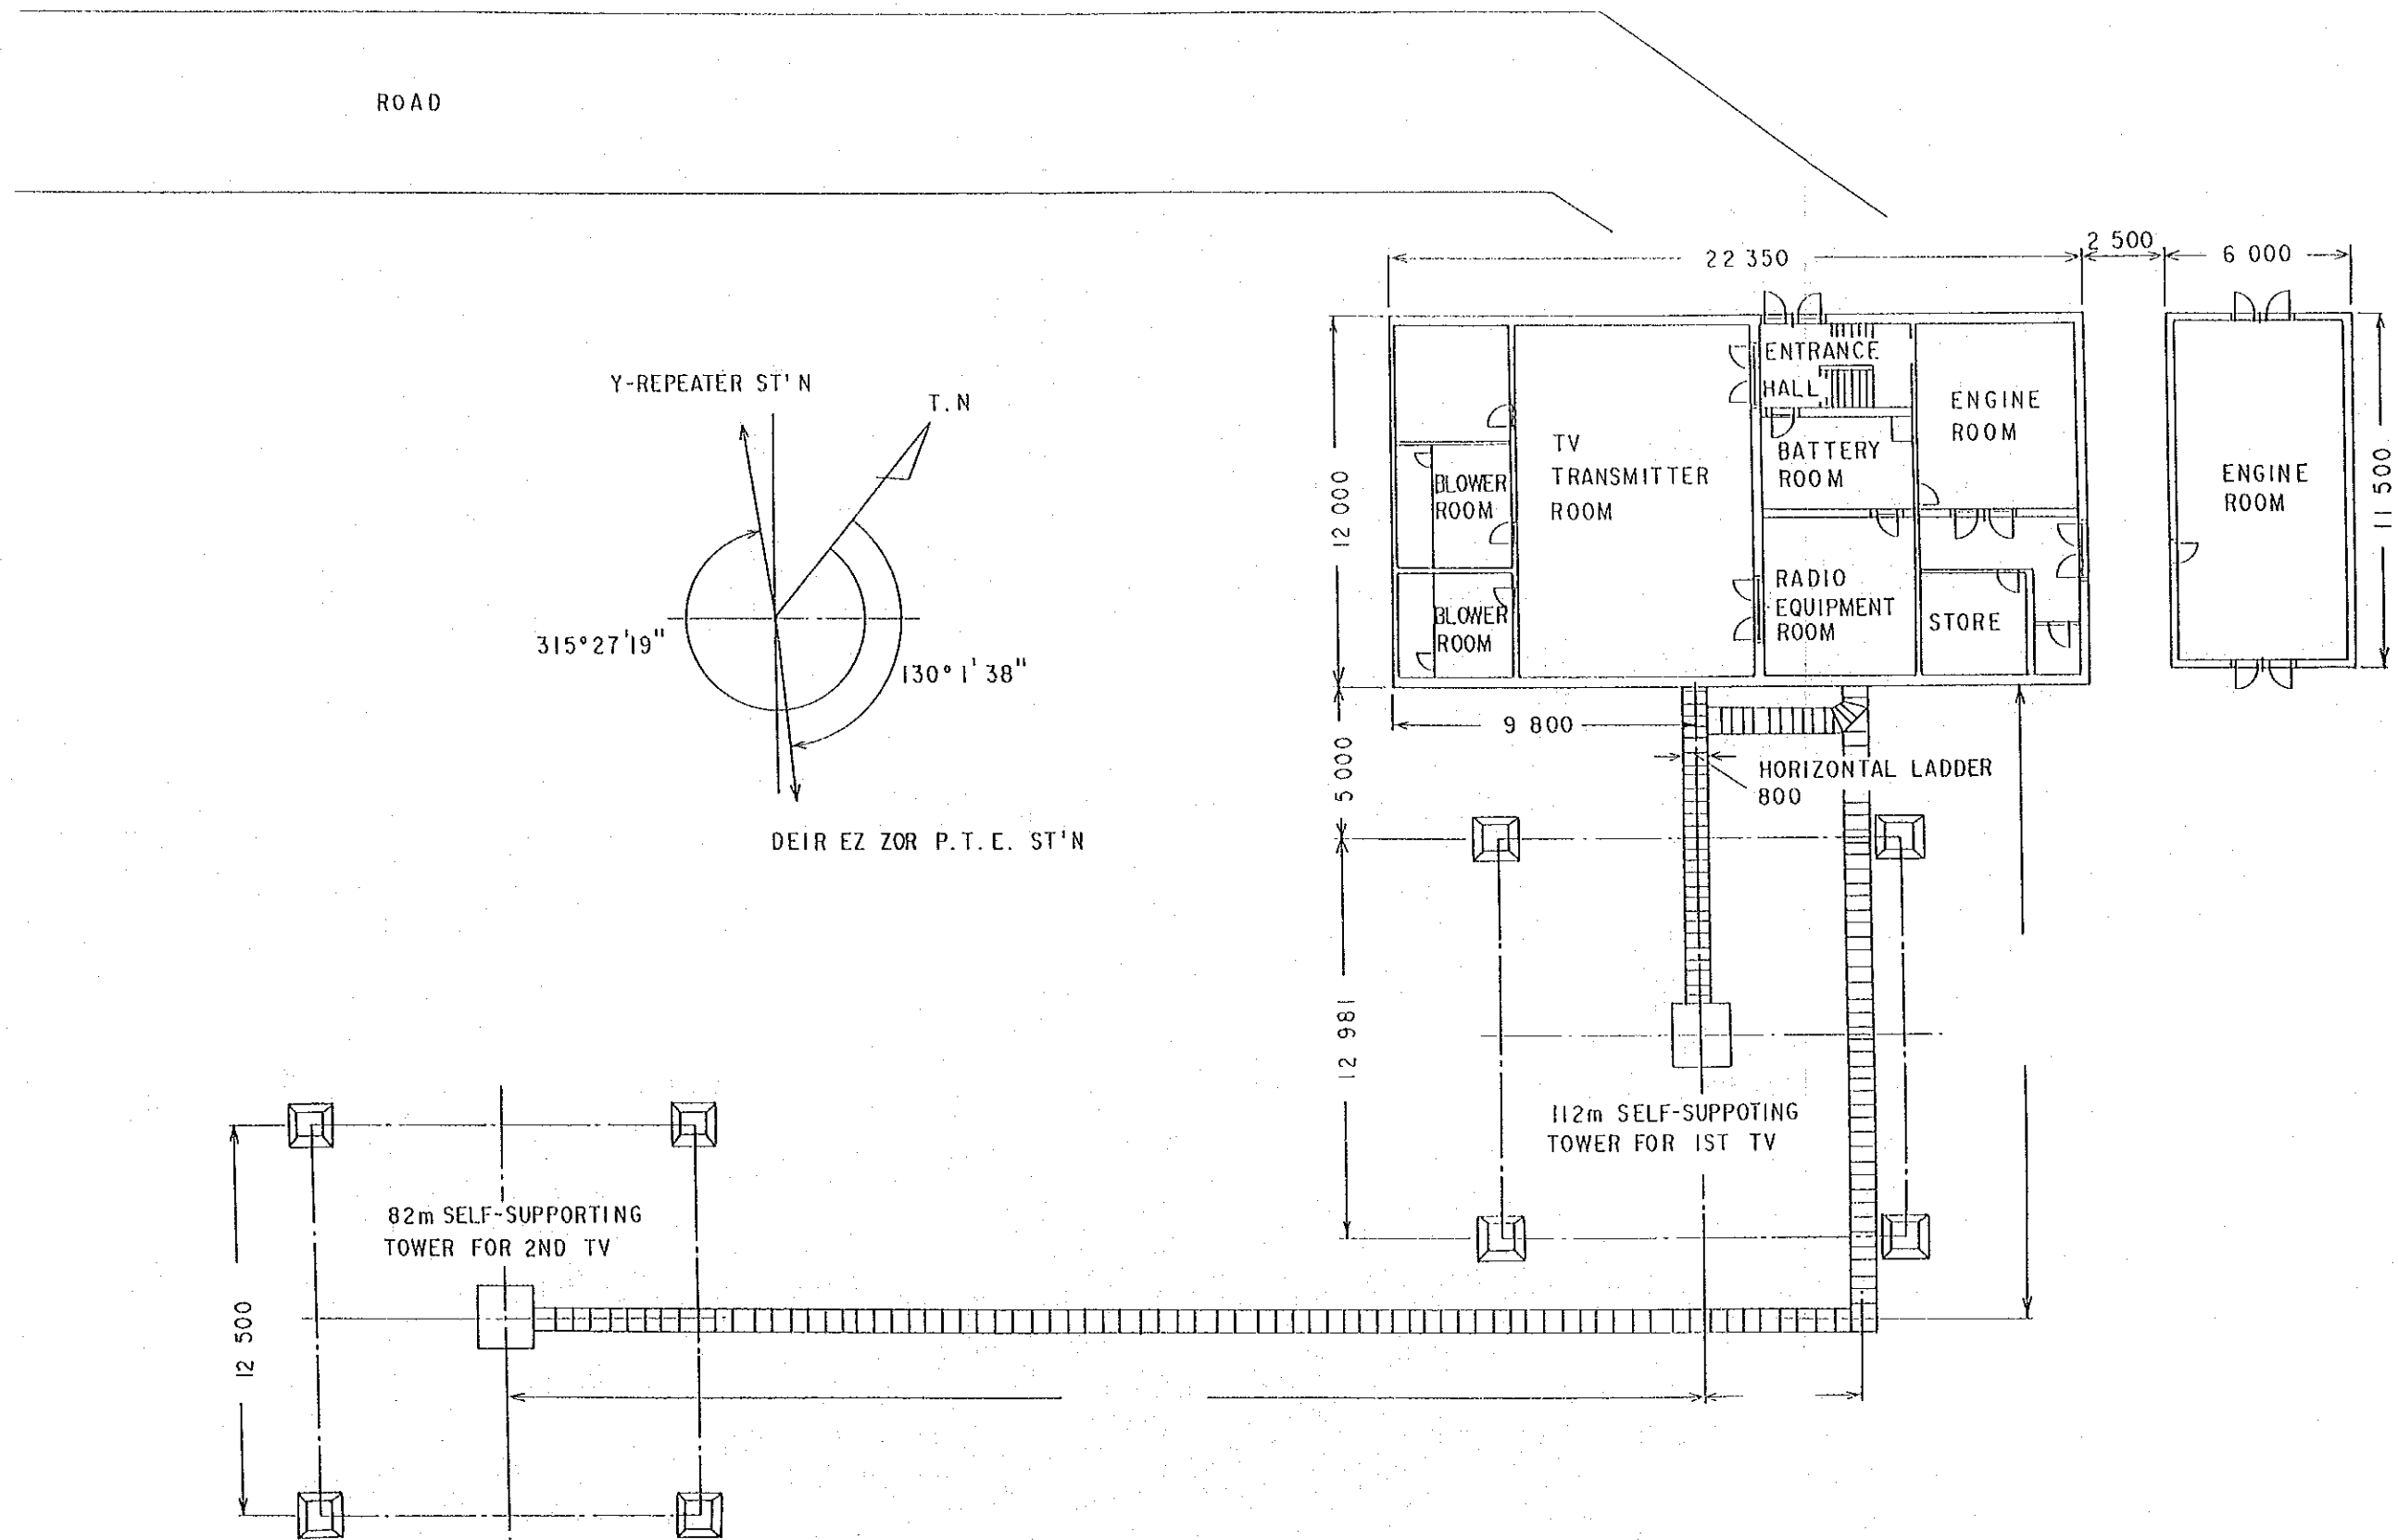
SITE LAYOUT FOR DEIR EZ ZOR STATION
